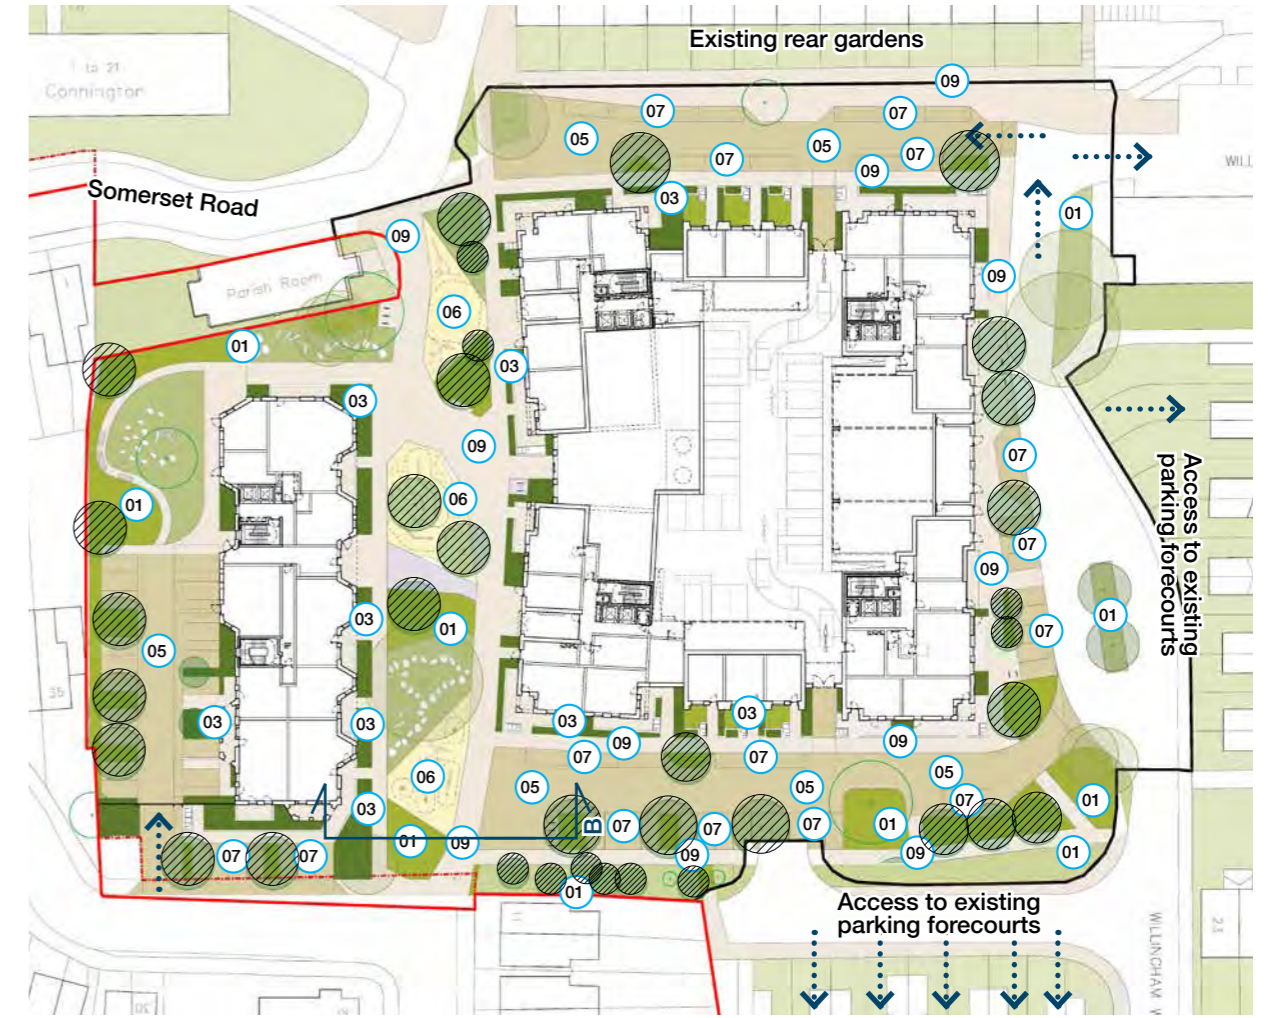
Proposed ground floor landscape plan, Plots B and E
